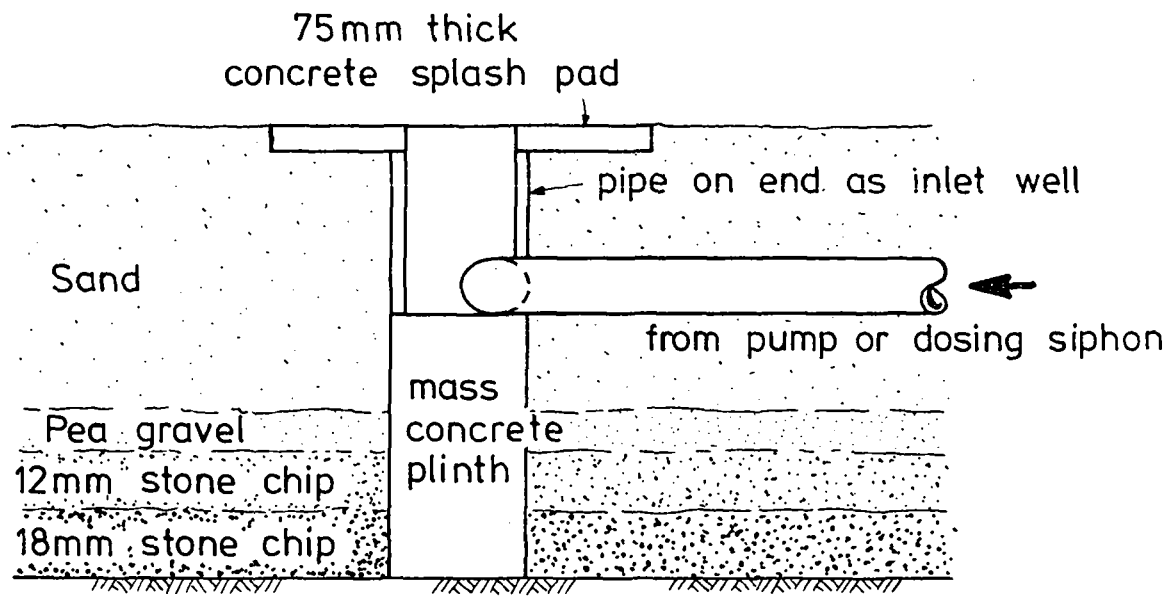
GENERAL ARRANGEMENT OF INLET TO BEDS
